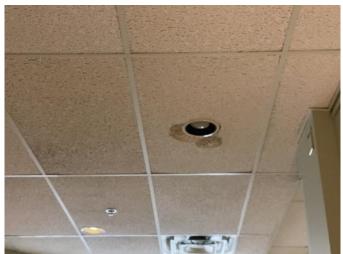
View of water staining observed on the ceiling tiles of the second floor (radio station unit).
